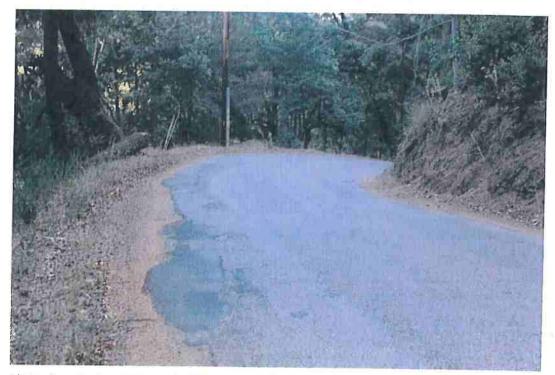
Mile 2.2: 20-ft road width with 1-ft shoulders.
